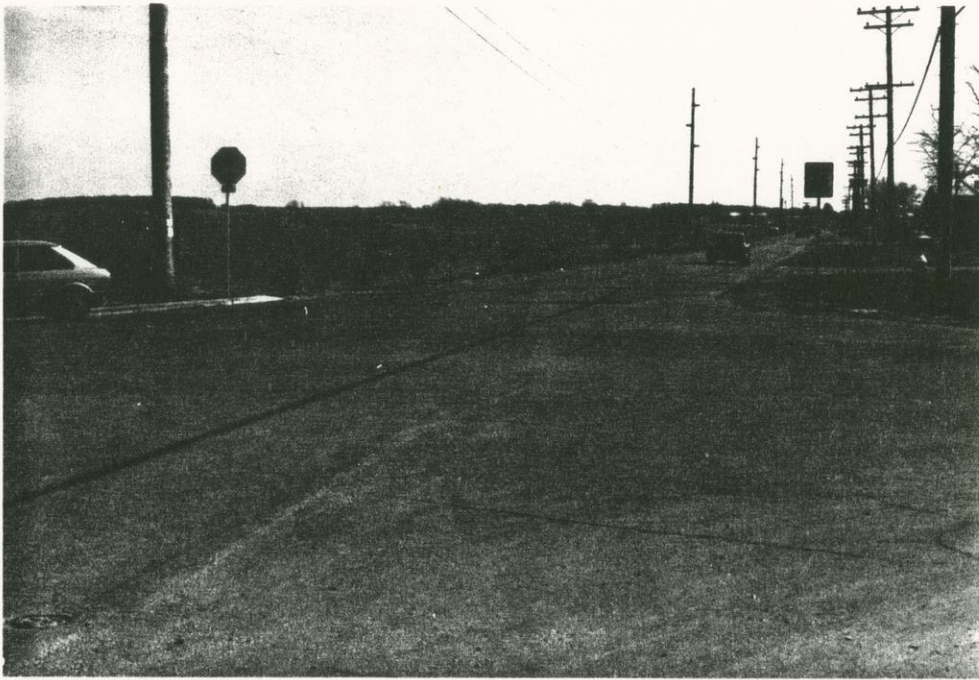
Looking south along existing Raywood Road from Royal Avenue Intersection.
